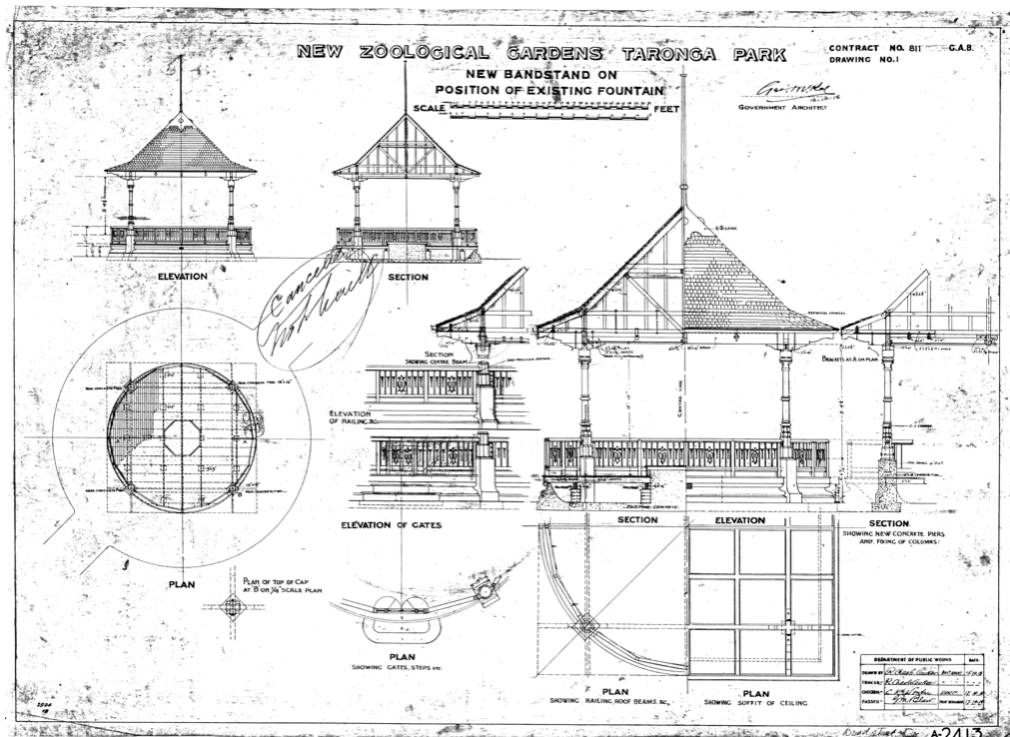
This Government Architects 1918 architectural drawing is titled “New Bandstand on Position of Existing Fountain”. The profile of the fountain base drawn matches the 96B fountain base, there is an octagonal concrete base at the centre and four blocks around the rim. This drawing confirms the fountain existed in 1918. The plan did not proceed – the drawing is annotated cancelled. Source: PWD Plan Room, now Plan Services
